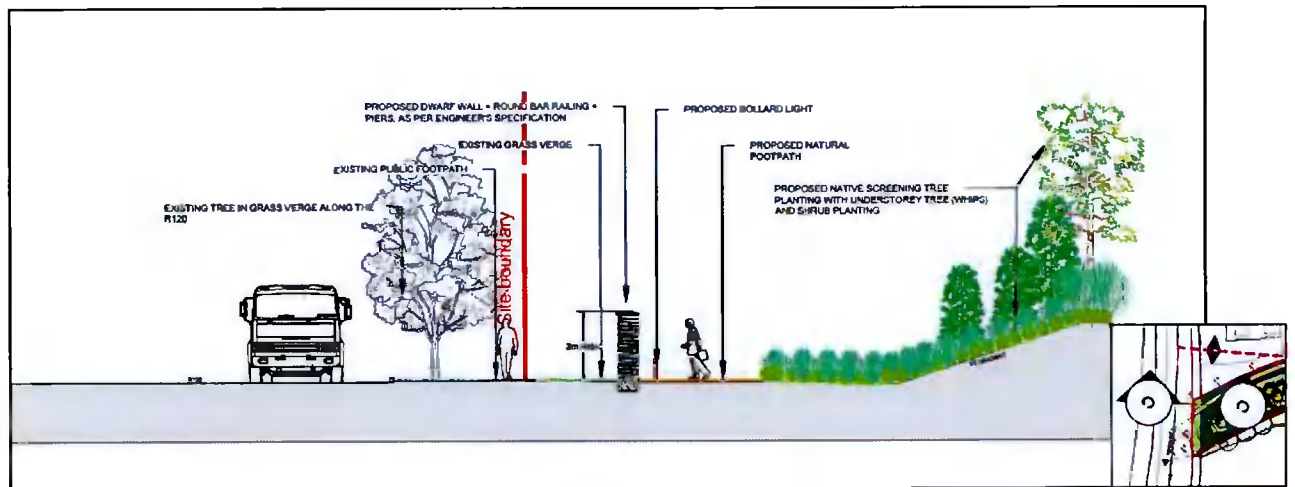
Section C-C (Drawing No.: FDJ-JBAI-XX-XX-DR-L-0003)
